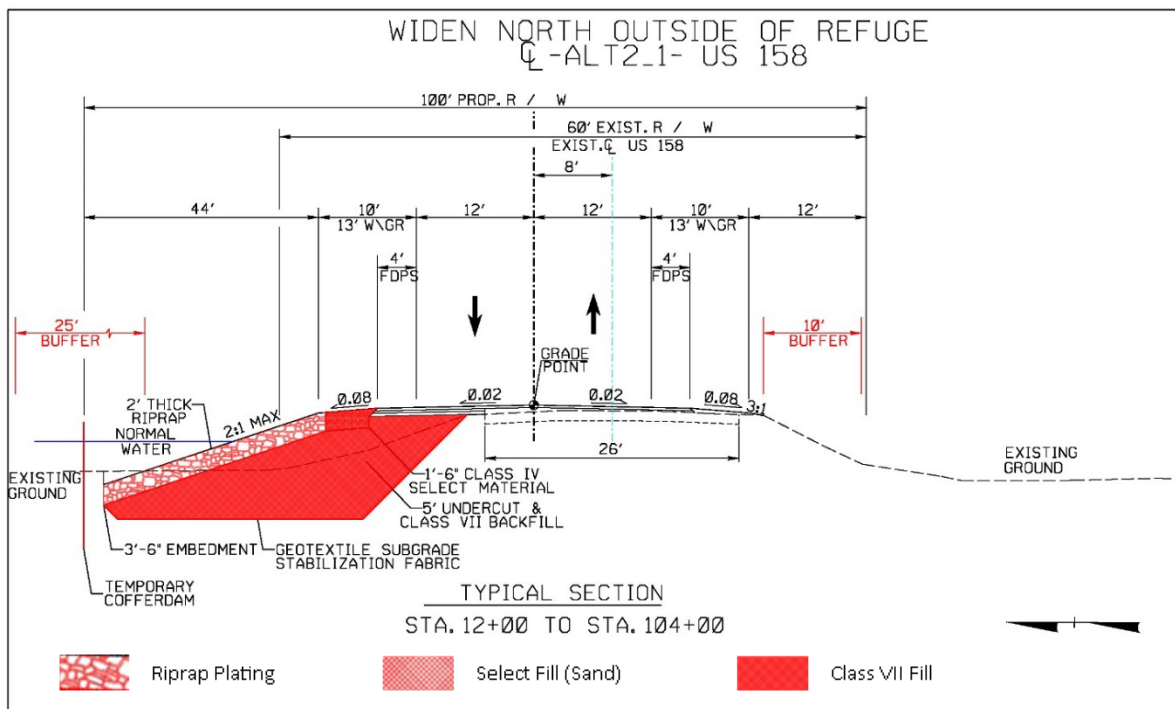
Alternative 2 Construction Methods and Undercut/Backfill Areas
